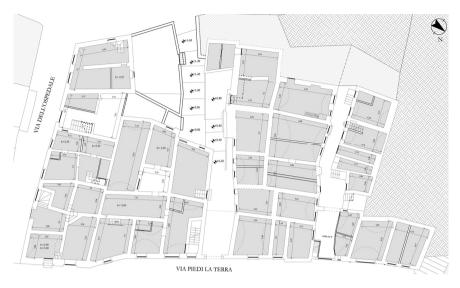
Survey of the section of the urban fabric – ground floor plan.
